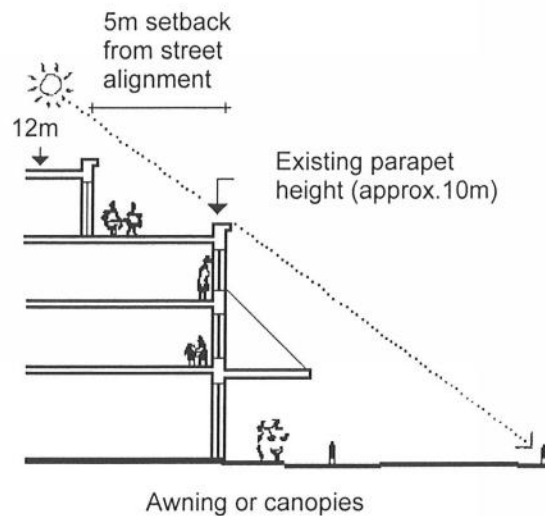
Building envelope which applies to No's.36 to 40 and 35-45 McKeon Street. This envelope control also applies to new development adjoining the north-western side of the Maroubra Bay Hotel.
